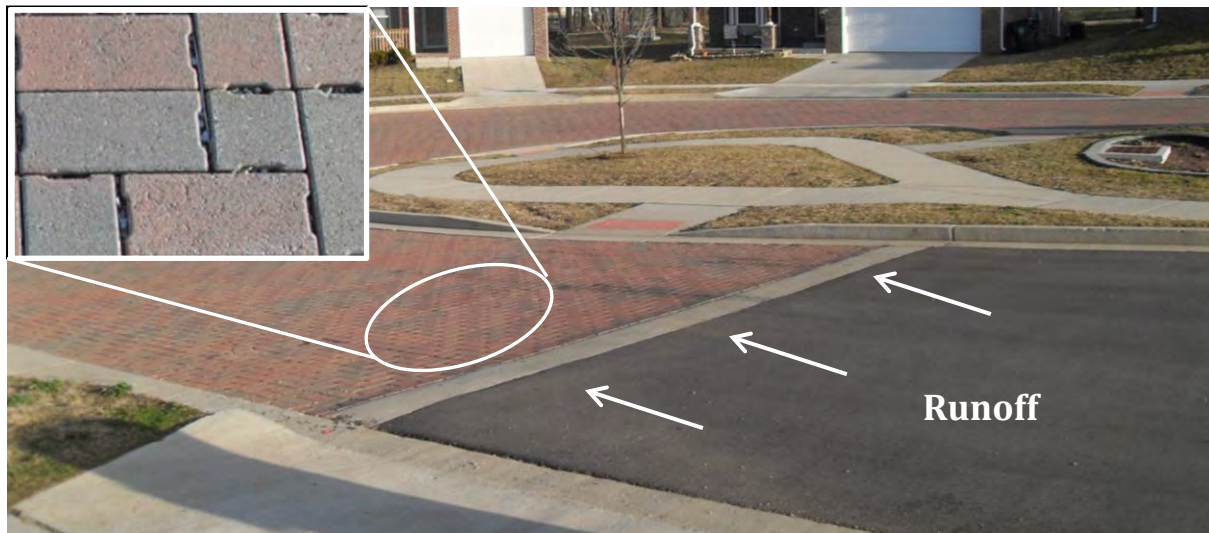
Example of Impervious runoff routing to a pervious surface (permeable paver stones)
